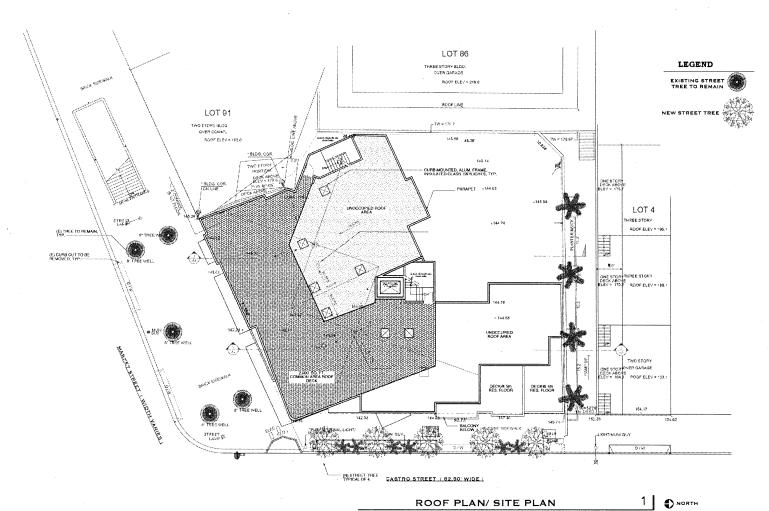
Proposed Roof Plan/Site Plan Source: Sternberg Benjamin, January 2011 (not to scale)
